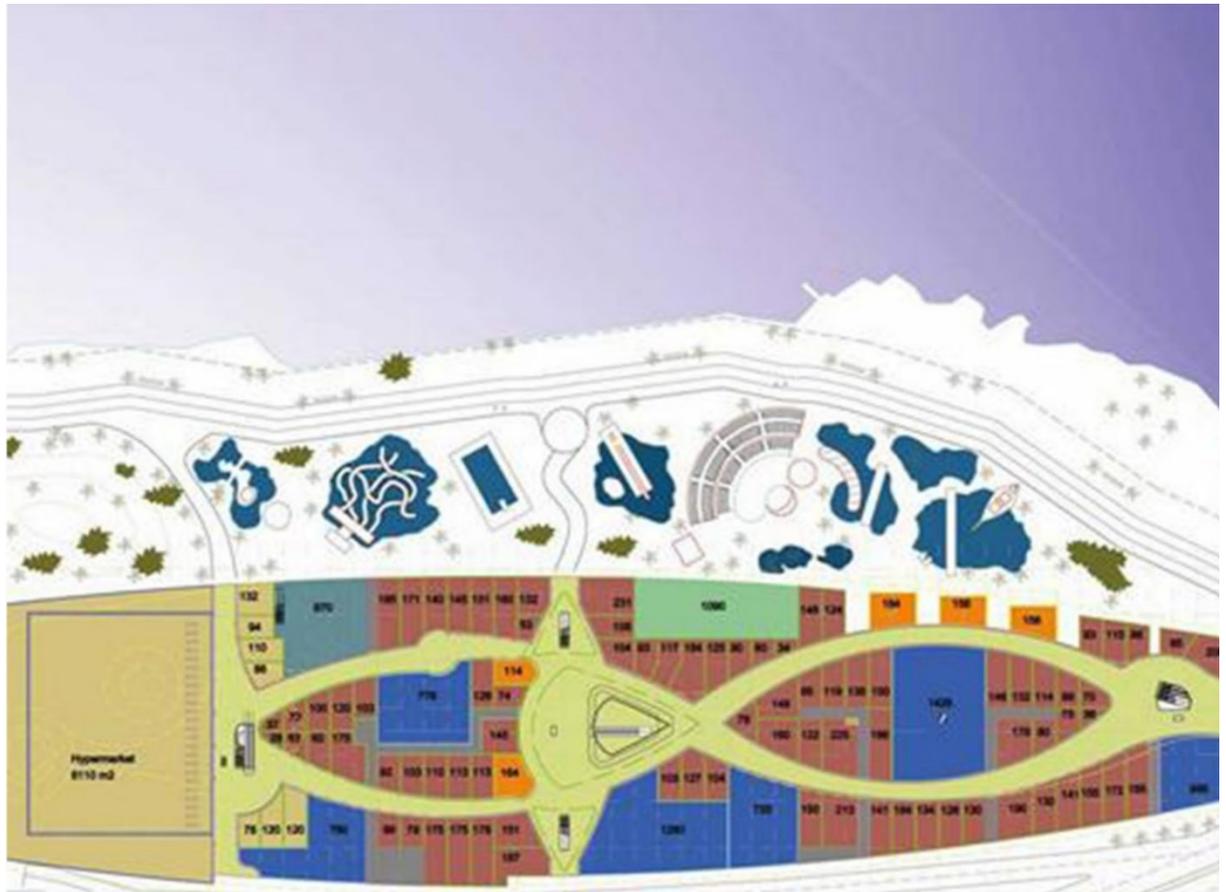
Morocco Mall in Casablanca. Schematic ground floor plan combined with site masterplan
